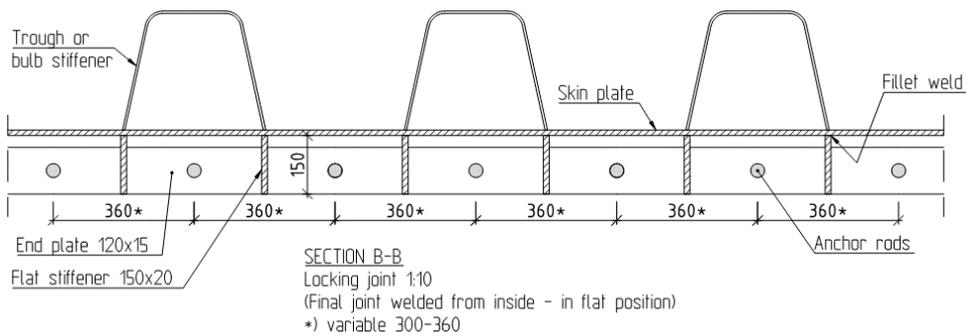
Locking joint for web- and bottom plates, construction joint 1 & 2, transverse section
